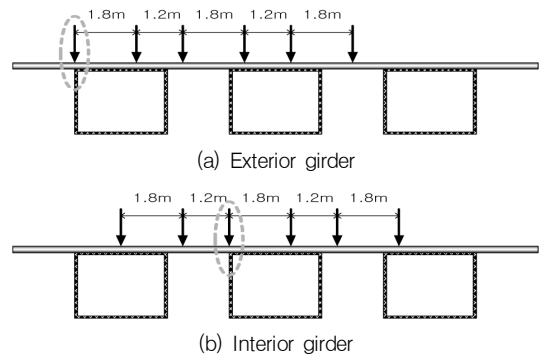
Truck wheel loading for 3 lanes at a transverse section
